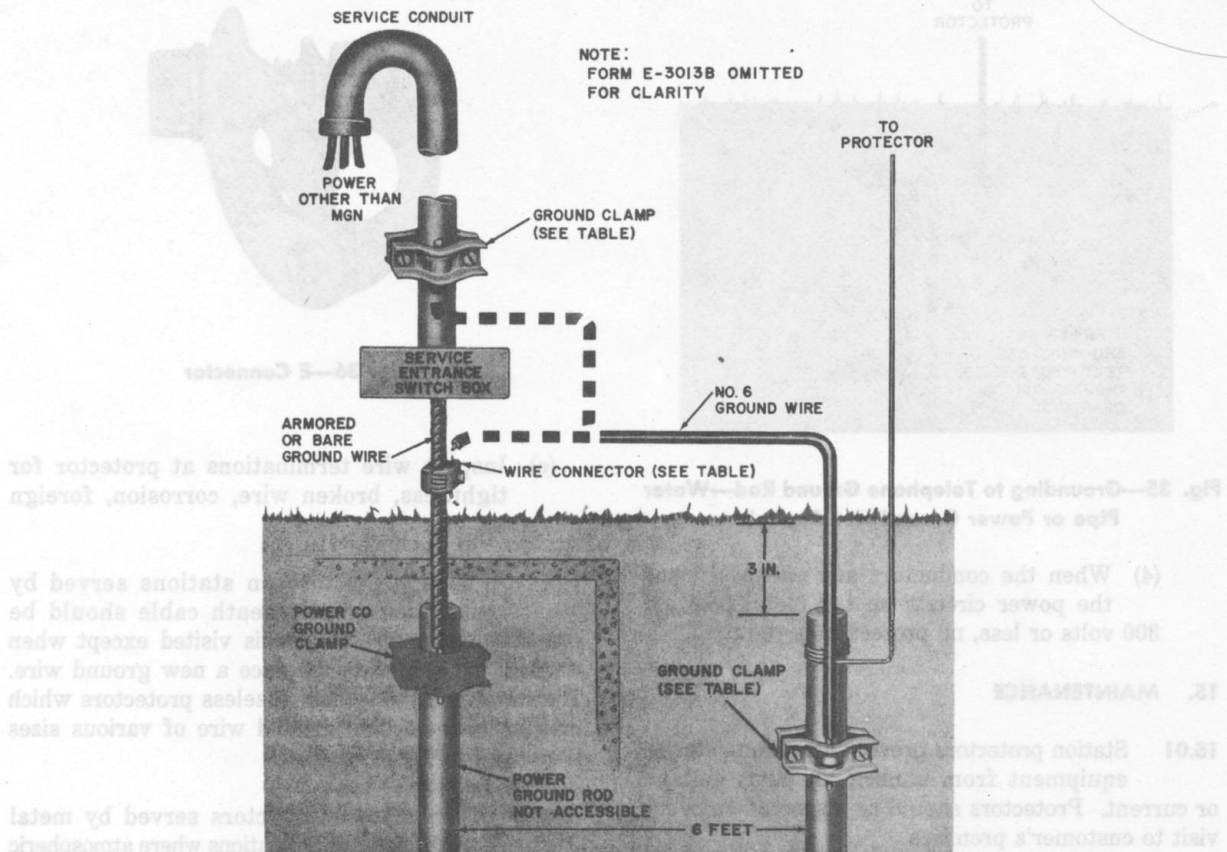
Power Other Than MGN Grounded to Inaccessible Ground Rod—No Water Pipe
